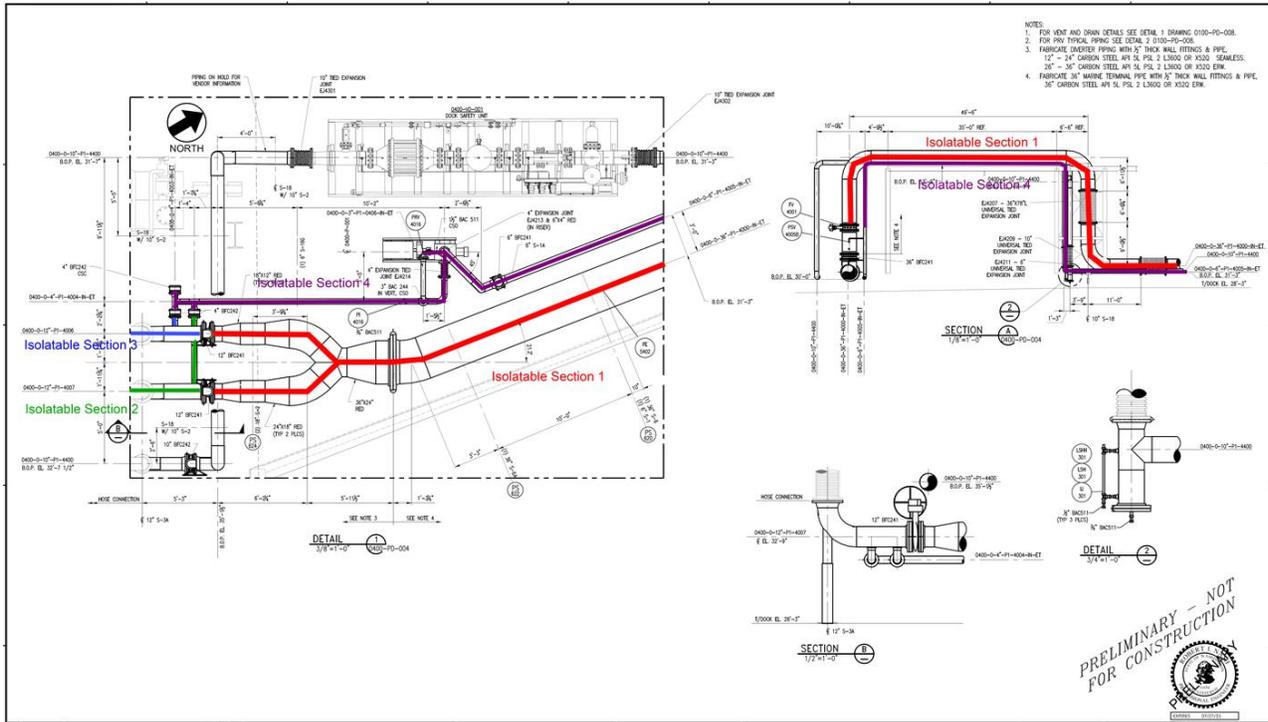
Isolatable Sections Showing Loading Pipelines Connected to Loading Branches (Ref. (1))
